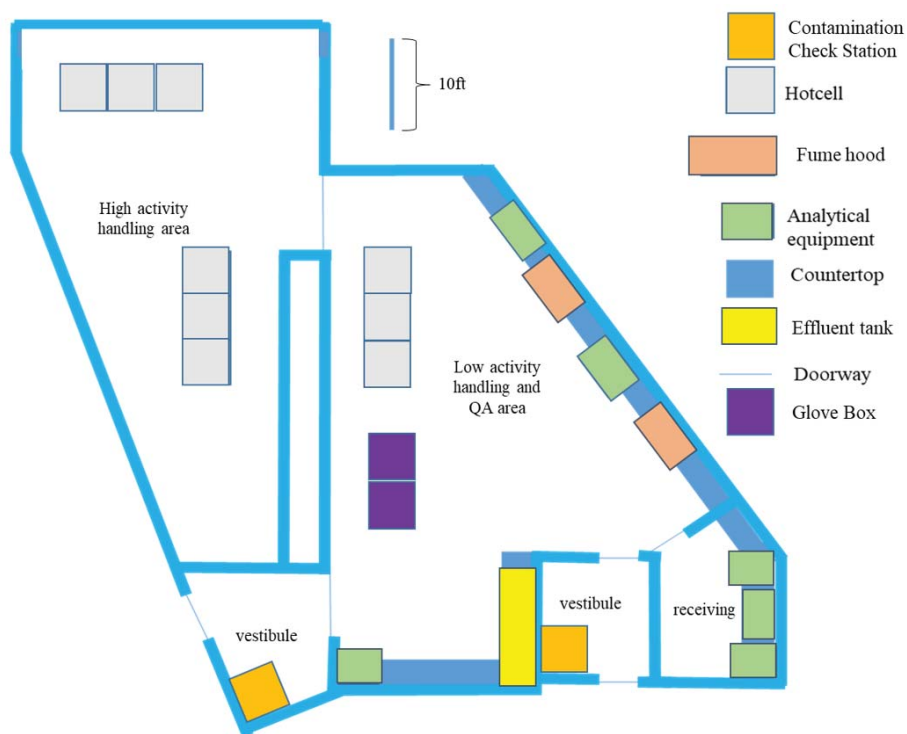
Isotope Harvesting laboratory layout. The Isotope Harvesting facility would be located in a new high bay building that was constructed on the FRIB site with non-federal funds.
